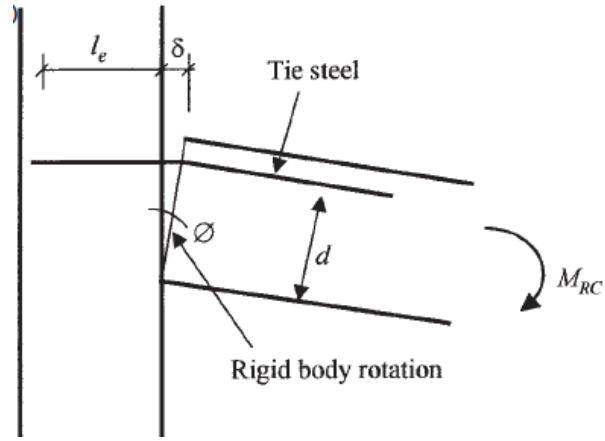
Interface joint rotation due to joint opening (Elliott *et al*, 2003)
